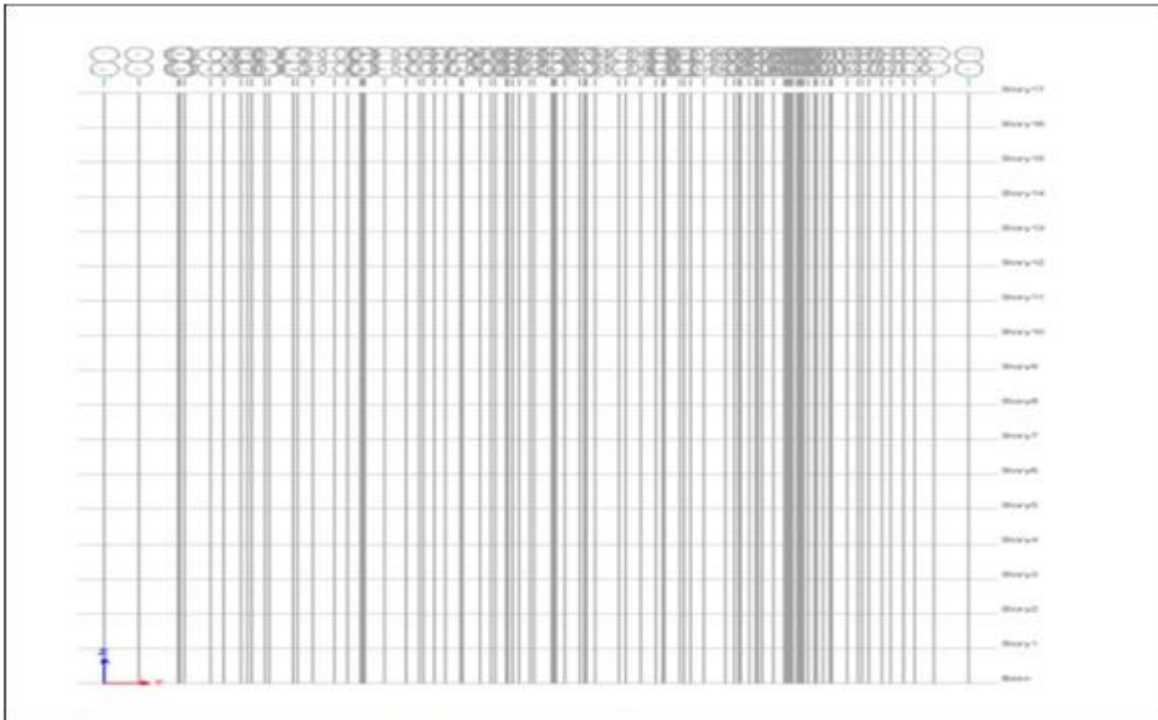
Elevation of (G+15) multi-storied building in ETABS
